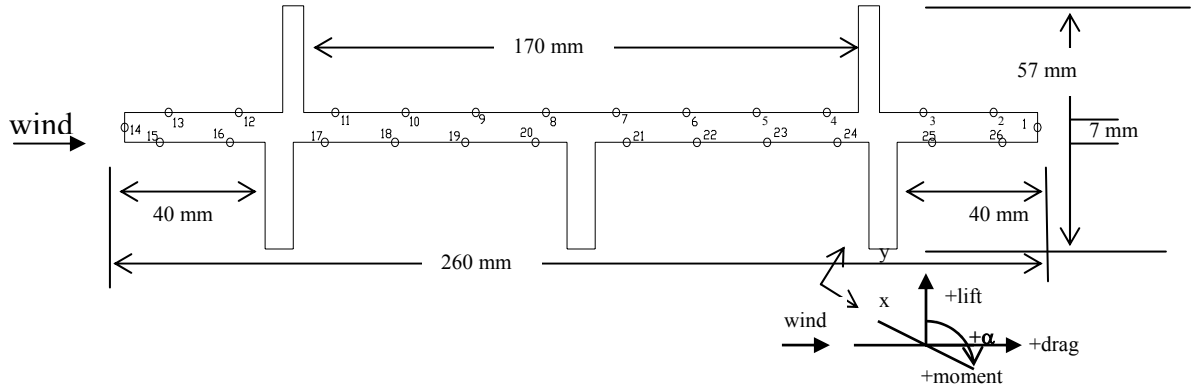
Cross-section of the bridge deck model and the sign convention for force
